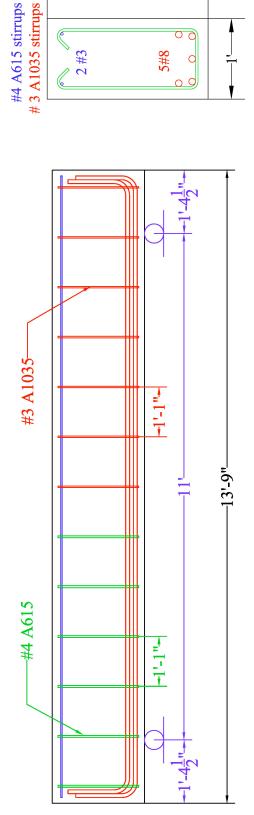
Elevation and Cross-Section Details for Specimen SR2
